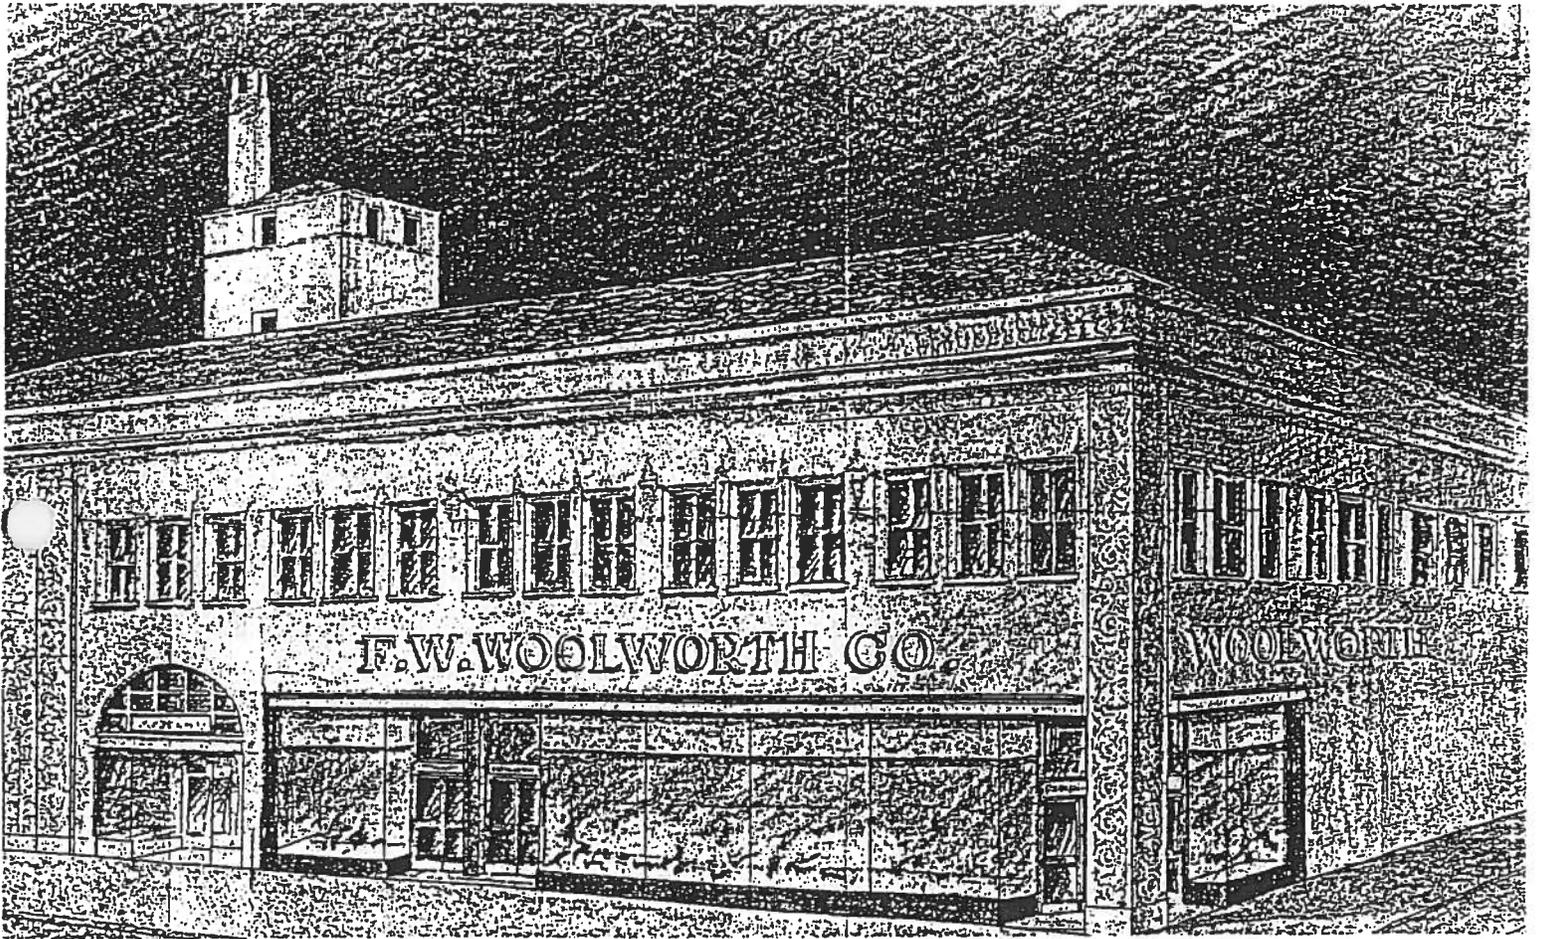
Woolworth's Architectural Plan 1949-north corner
